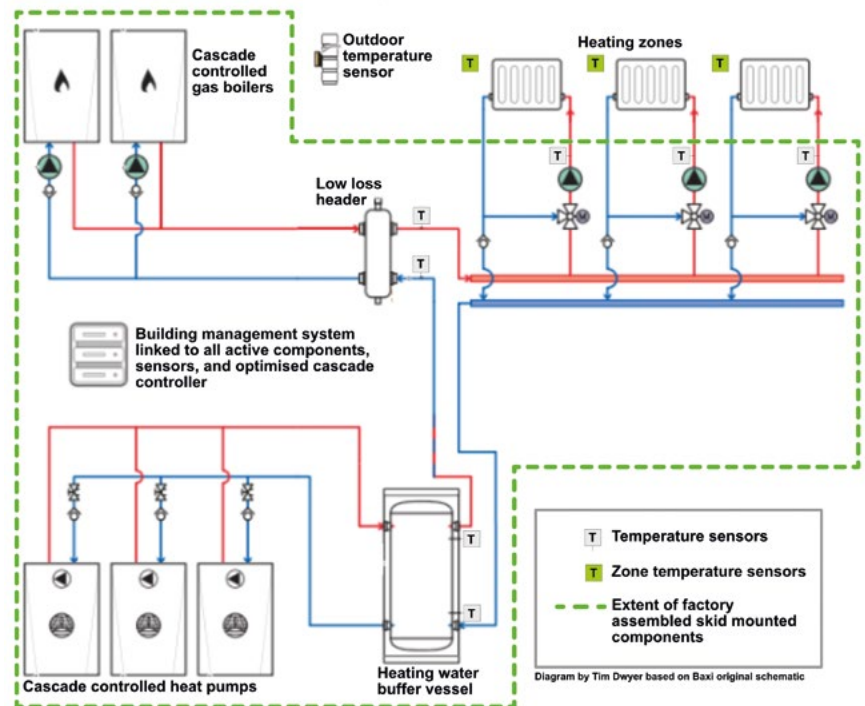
Example of a hybrid heating plant incorporating cascade-controlled boilers and heat pumps, with factory-assembled skid-mounted components, sensors and controls forming an integrated module ready for site connection and commissioning (Source: Baxi)
